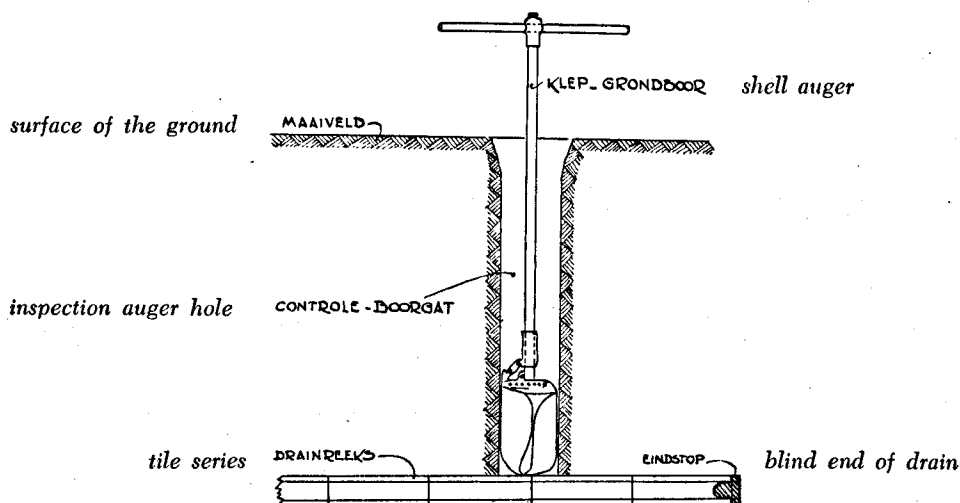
SECTIONAL VIEW OF AN INSPECTION AUGER HOLE.
